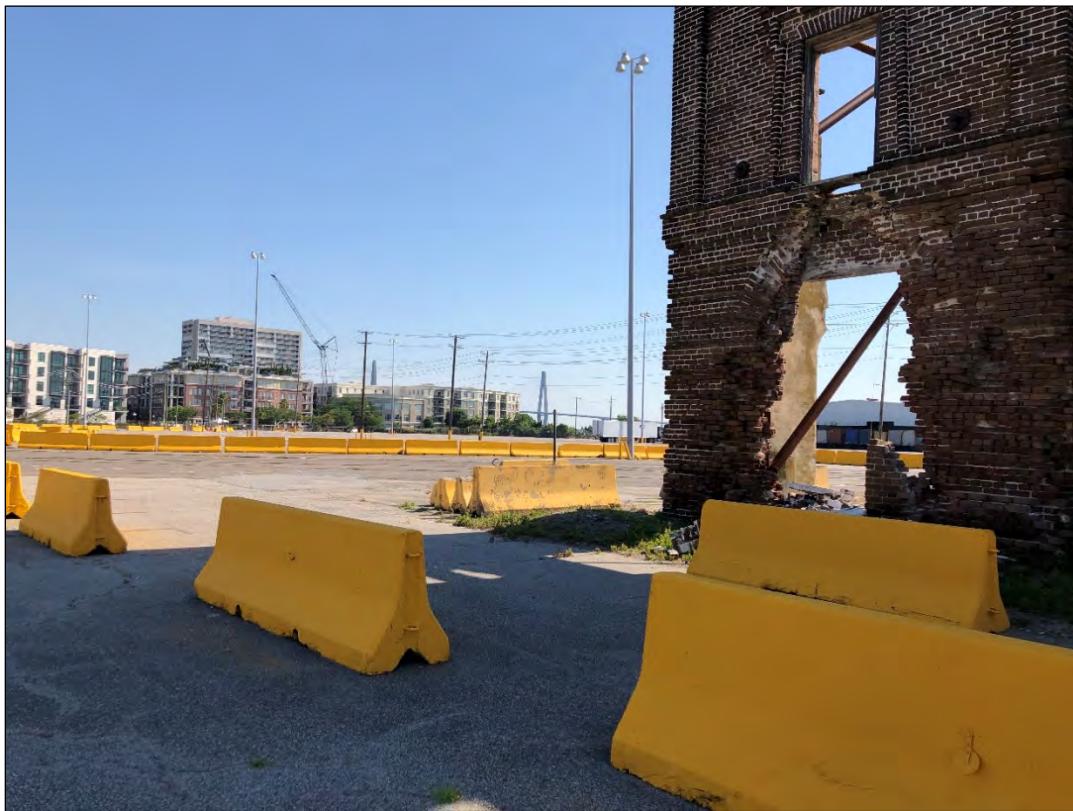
Modern residential development to the north of Union Pier property, facing northeast from Bennett Mill facade.
